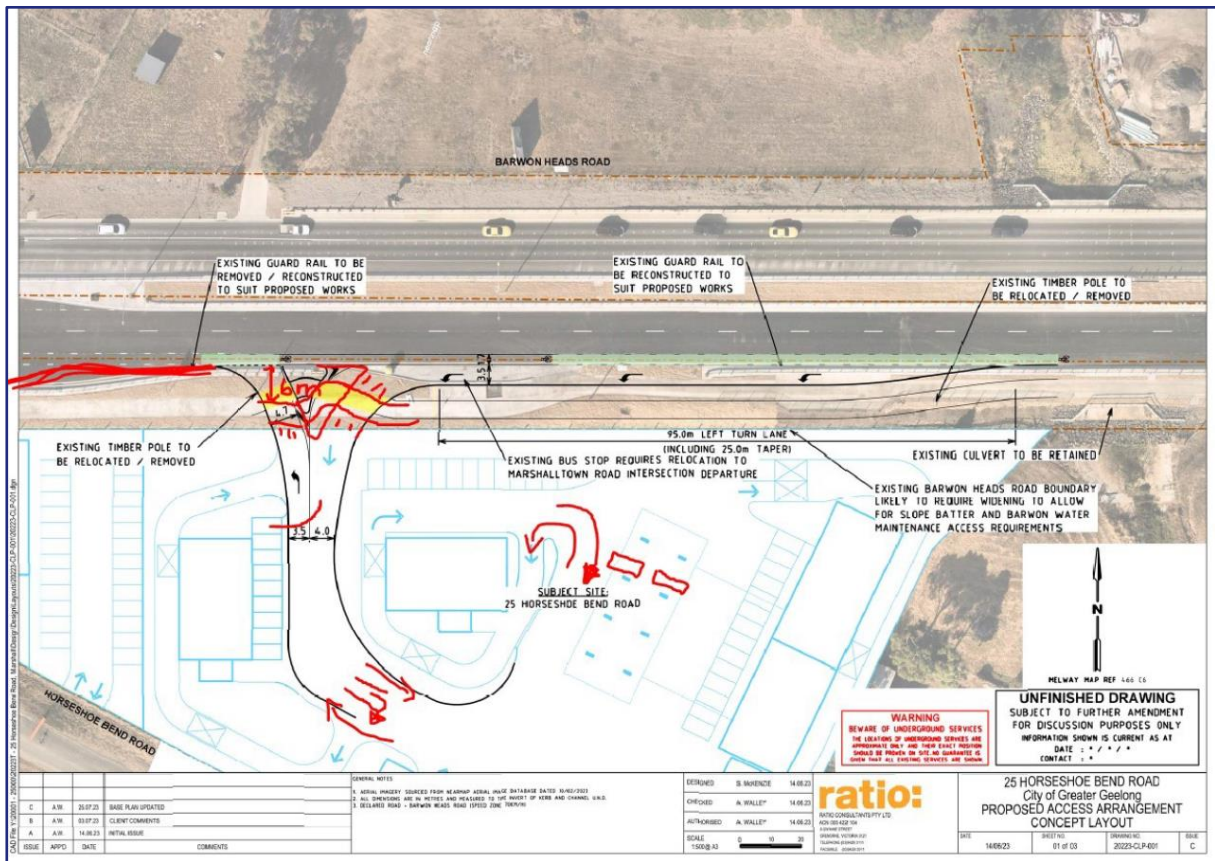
Ratio Plan - Barwon Heads Road Access to Property 20
